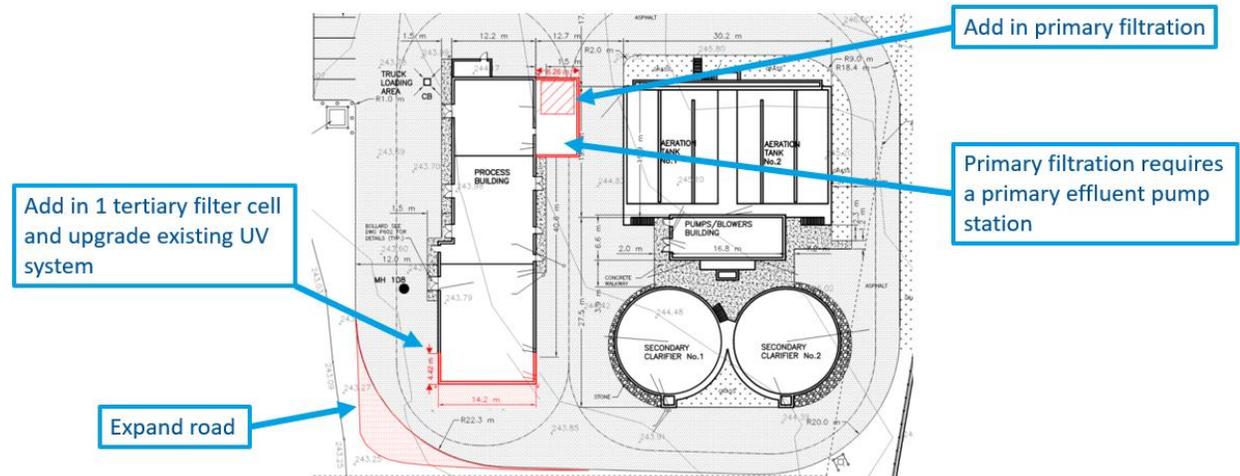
Alternative 1B - Expand Existing Treatment Process (Adding Primary Treatment)
